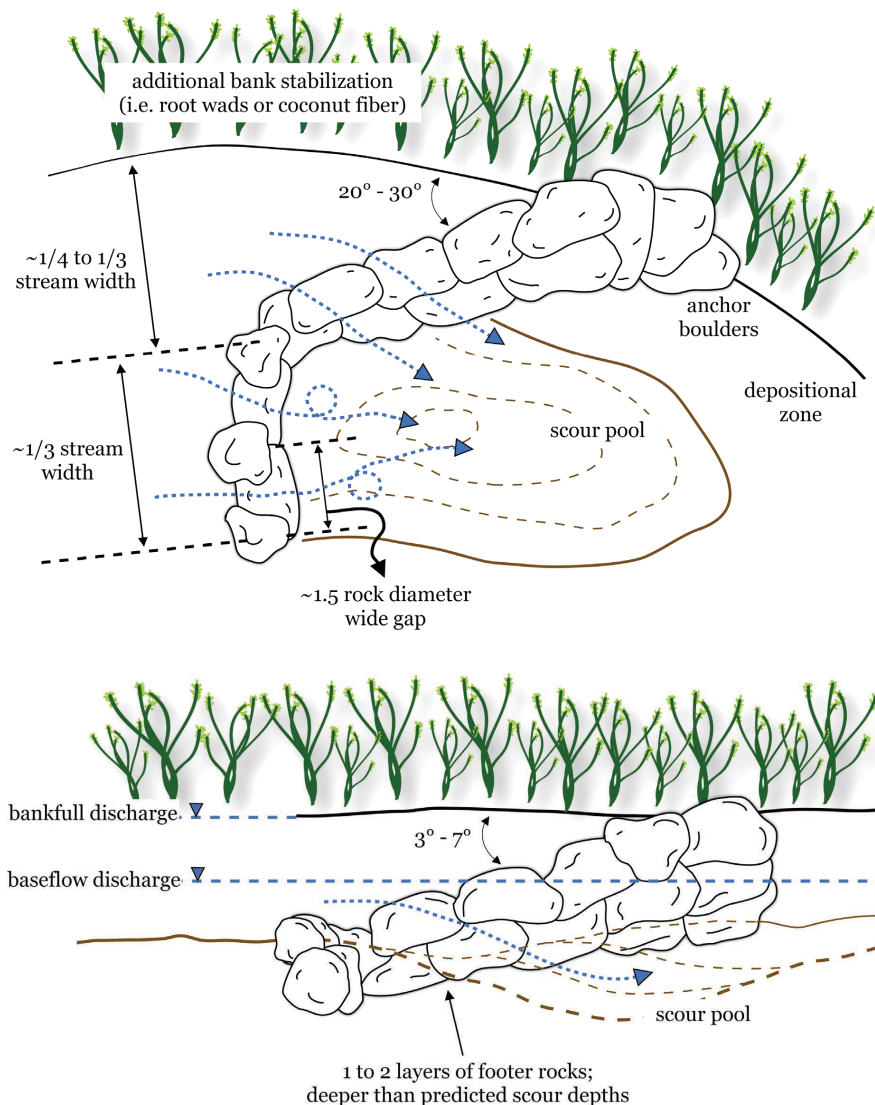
Typical J-hook vane installation (after Rosgen, 2006).
